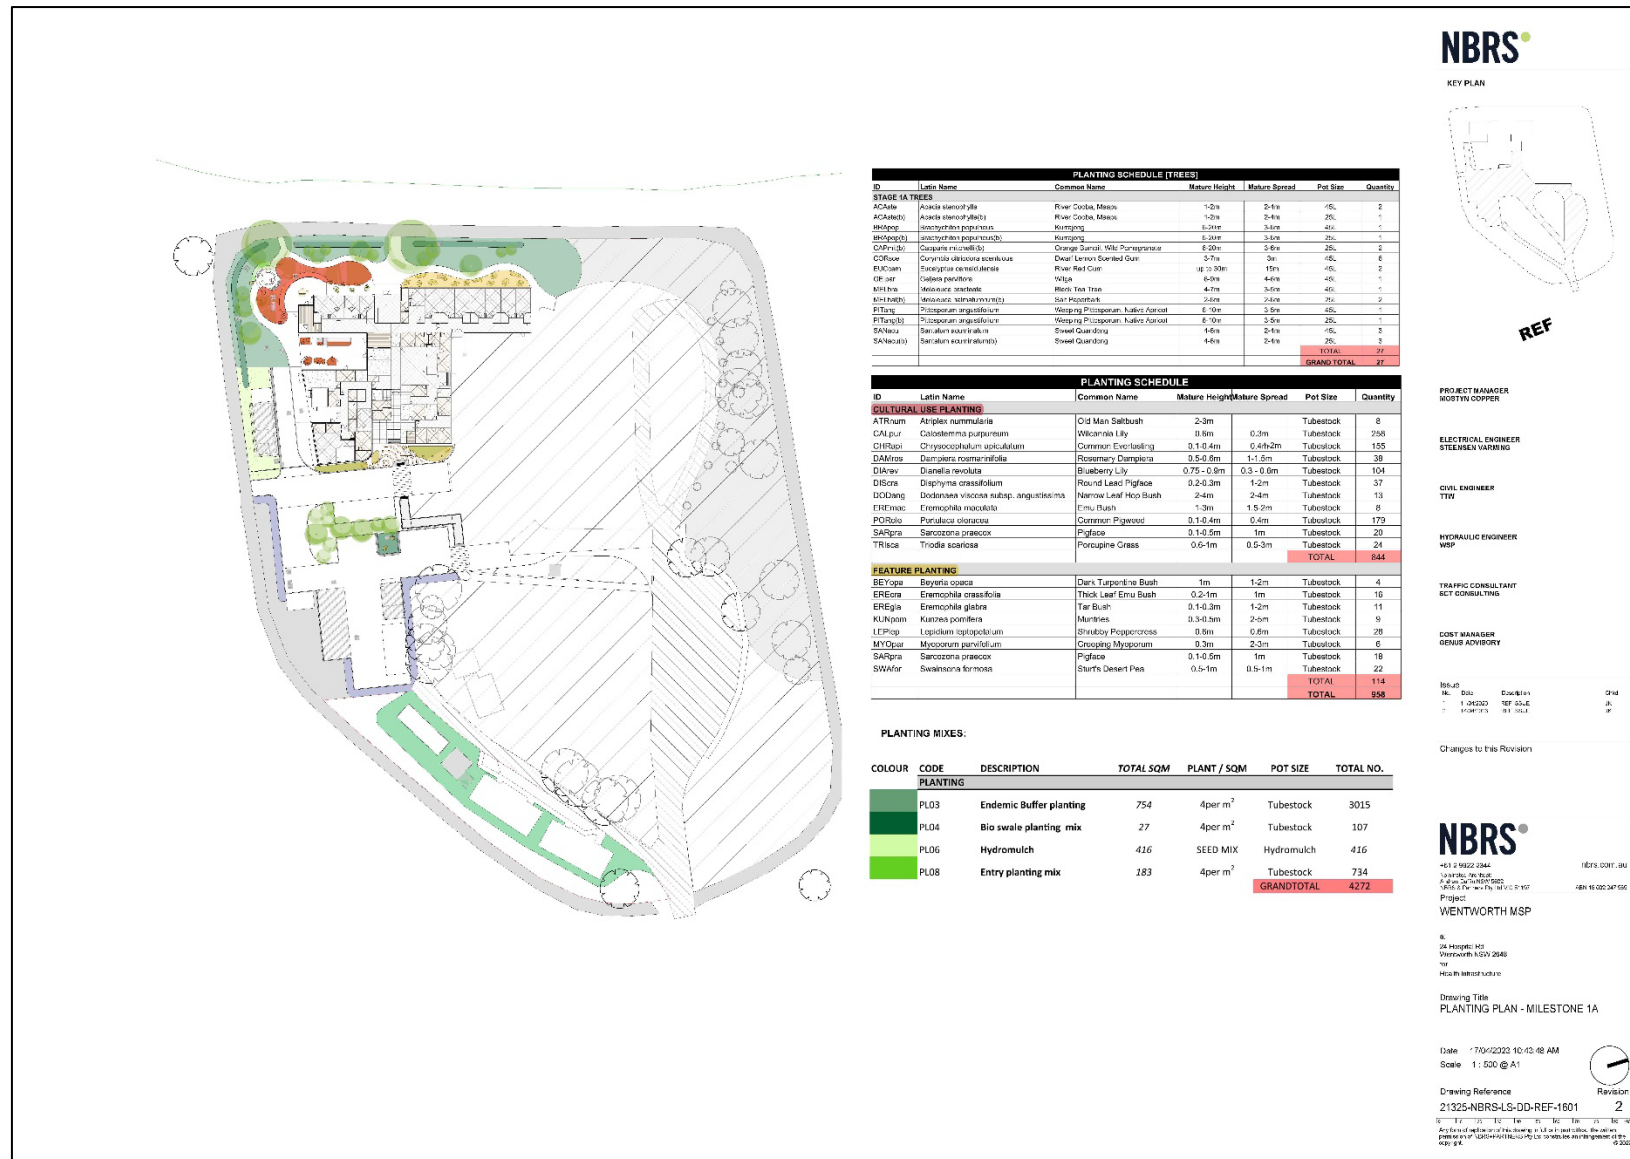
Wentworth Health Service Redevelopment Landscape Planting Plan.
